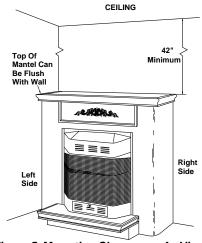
Mounting Clearances As Viewed From Front of Fireplace Shown with Optional Mantel
